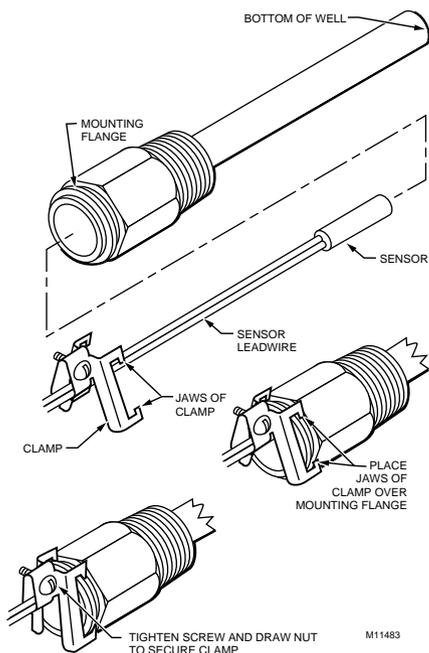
Secure sensor and leadwire with mounting clamp or spring (see Accessories).
